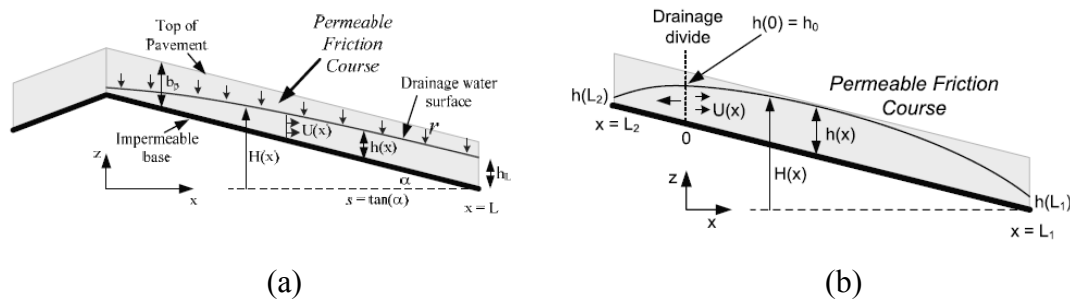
Flow within PFC pavements: (a) unidirectional drainage; and (b) divided drainage (Charbeneau and Barrett 2008)
